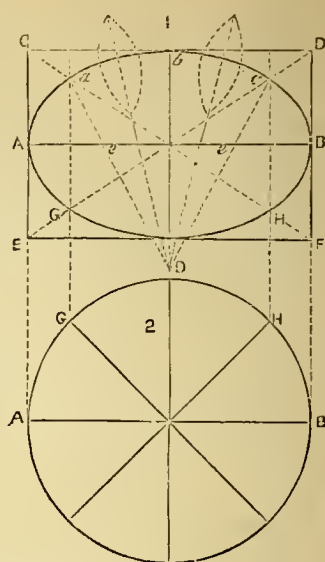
ELLIPTICAL FRAMES. 1, Elevation; 2, Plan.
